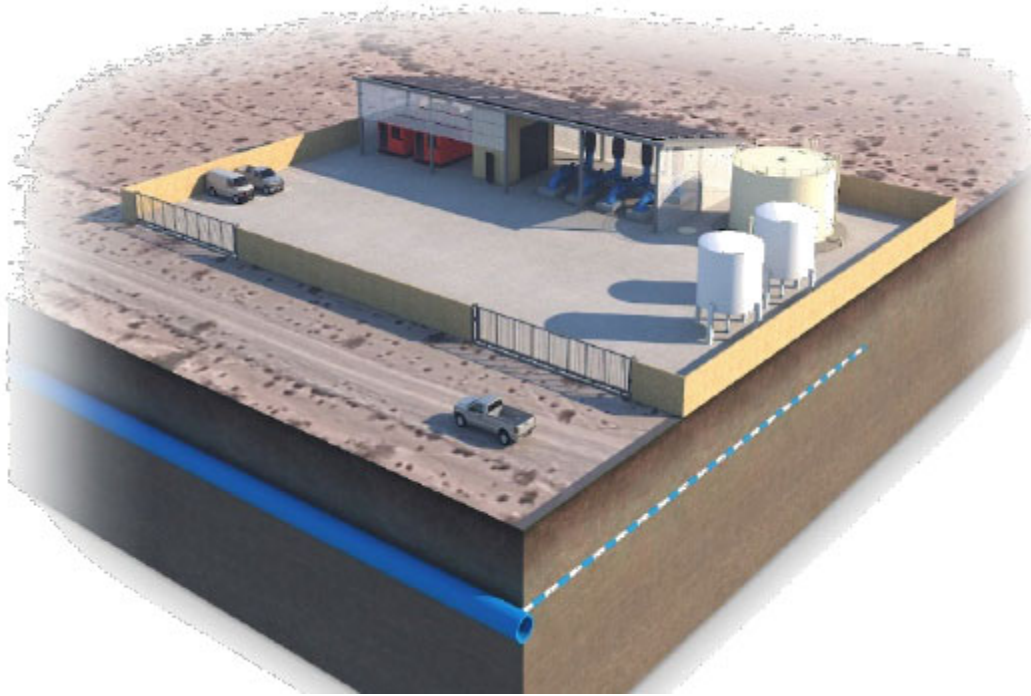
Preliminary Rendering for a Typical Pump Station Site Layout
